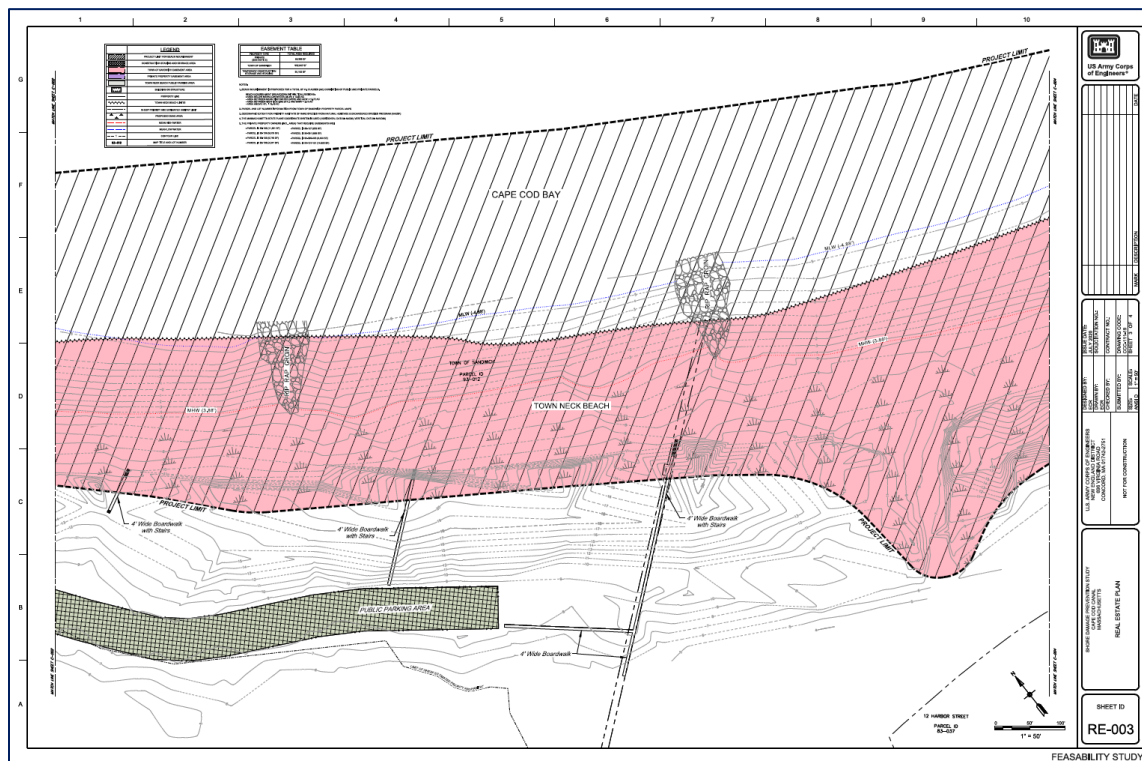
Real Estate Impacts of Recommended Plan sheet 3 of 4
